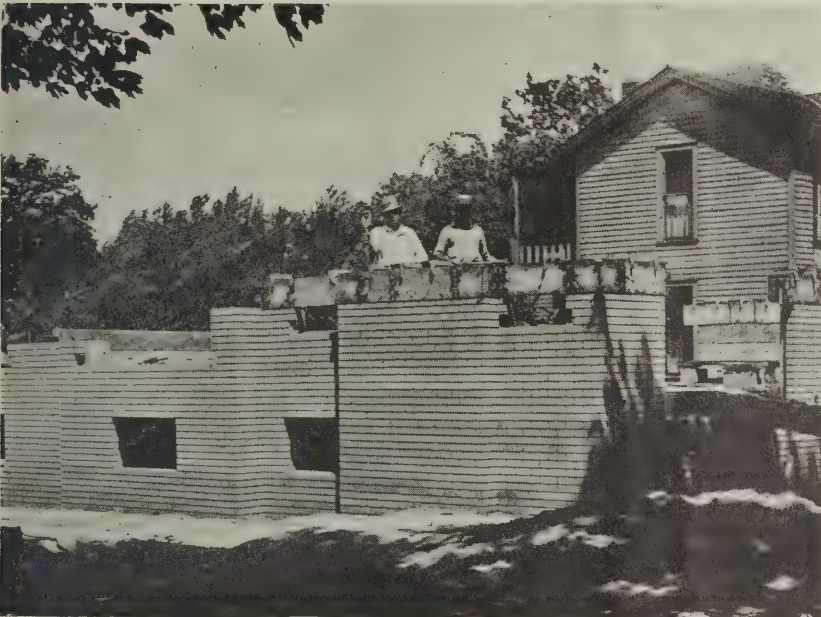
Imitation brick wall made with concrete metal forms of special design
